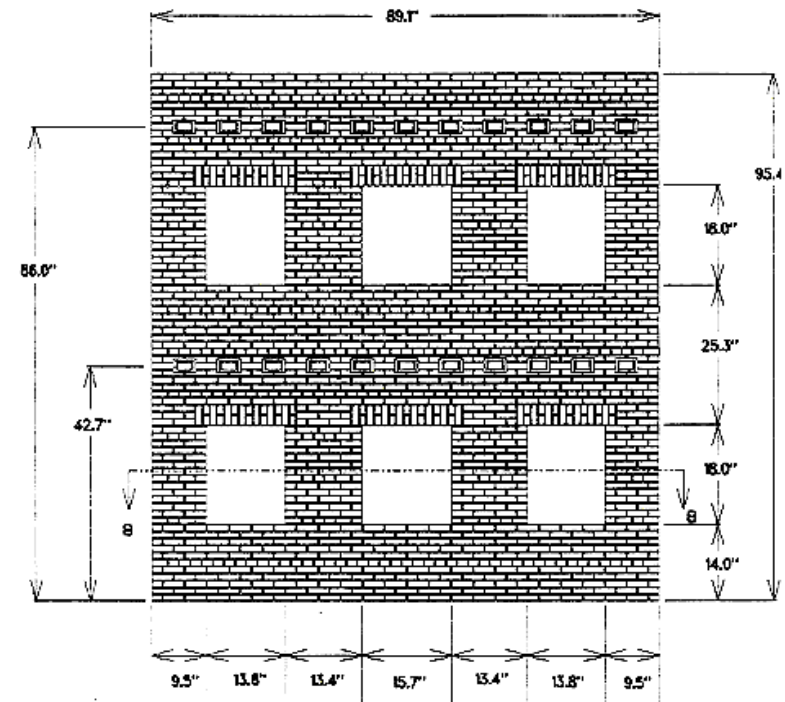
Window wall and out-of-plane wall of the tested structure S1 (Costley and Abrams 1996)
